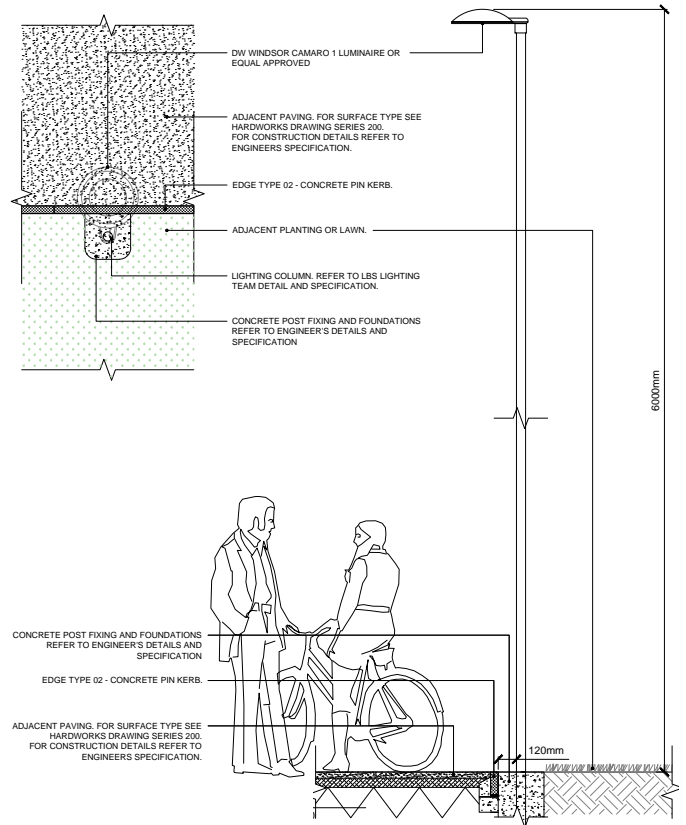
Lighting column Typical Detail (not to scale)
